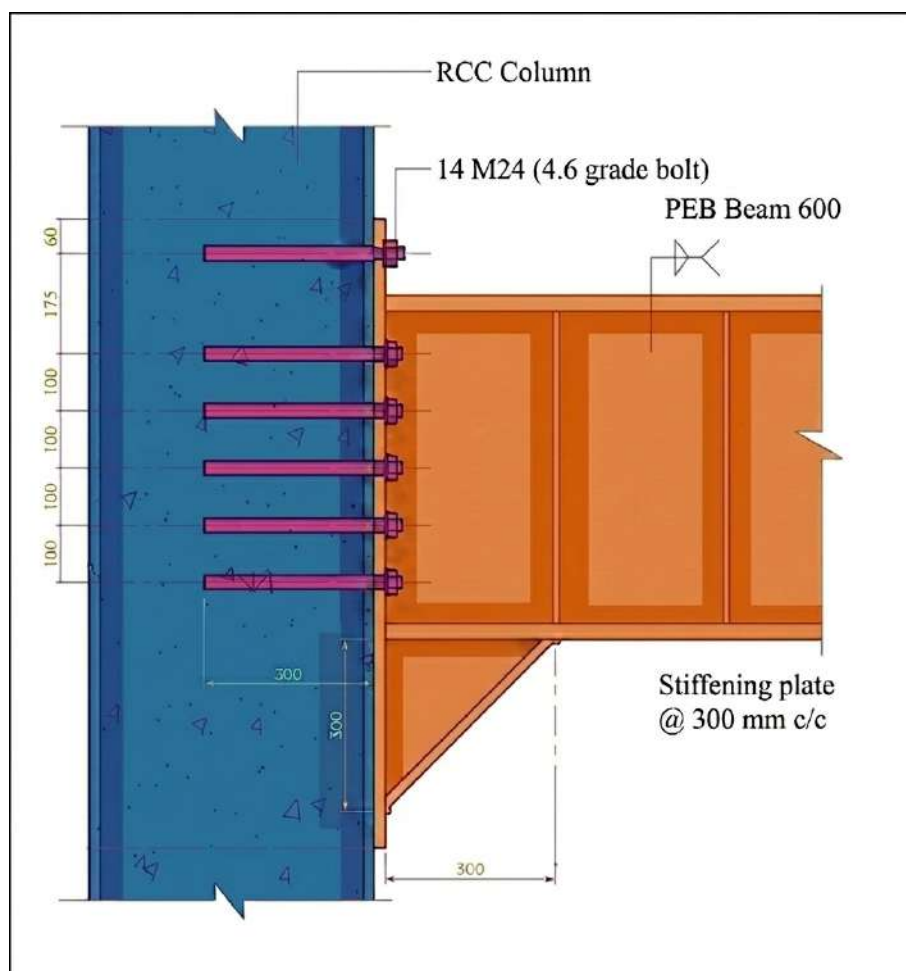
Schematic representation of RCC column-PEB beam connection
